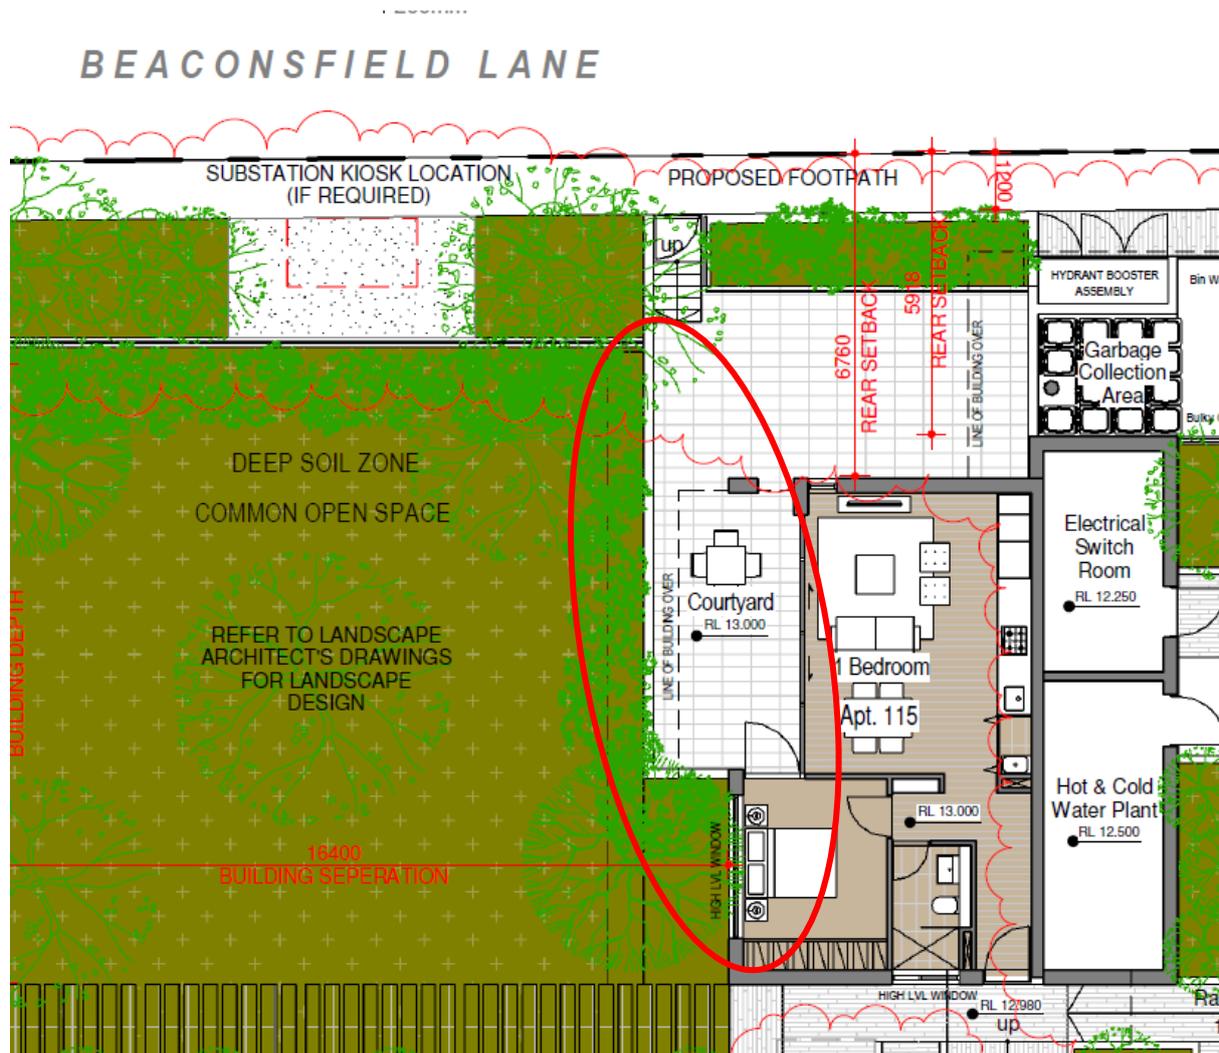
Ground floor plan extract, with interface between Apartment 115 and the ground floor common open space area circled in red.
